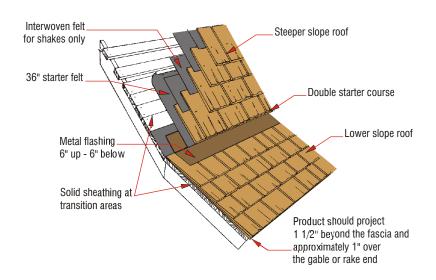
Low Slope to Steep Slope Roof Transition Detail - Certi-label Shakes (Certigrade shingle application is similar but without felt interlay)
